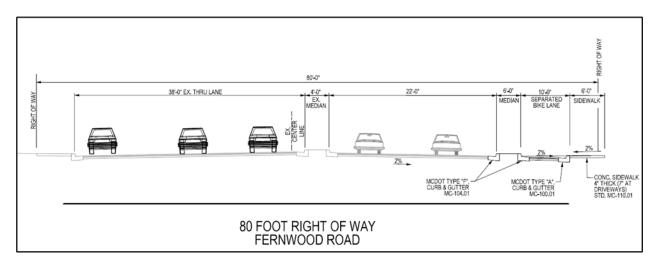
Proposed Fernwood Road Section (from Rock Spring Drive to Camalier property entrance)
